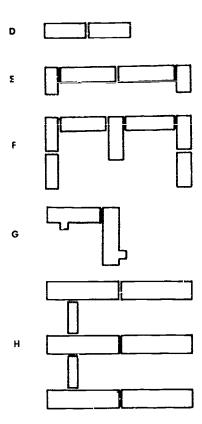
Suitability of typical school building plan types in Asia and the Pacific
